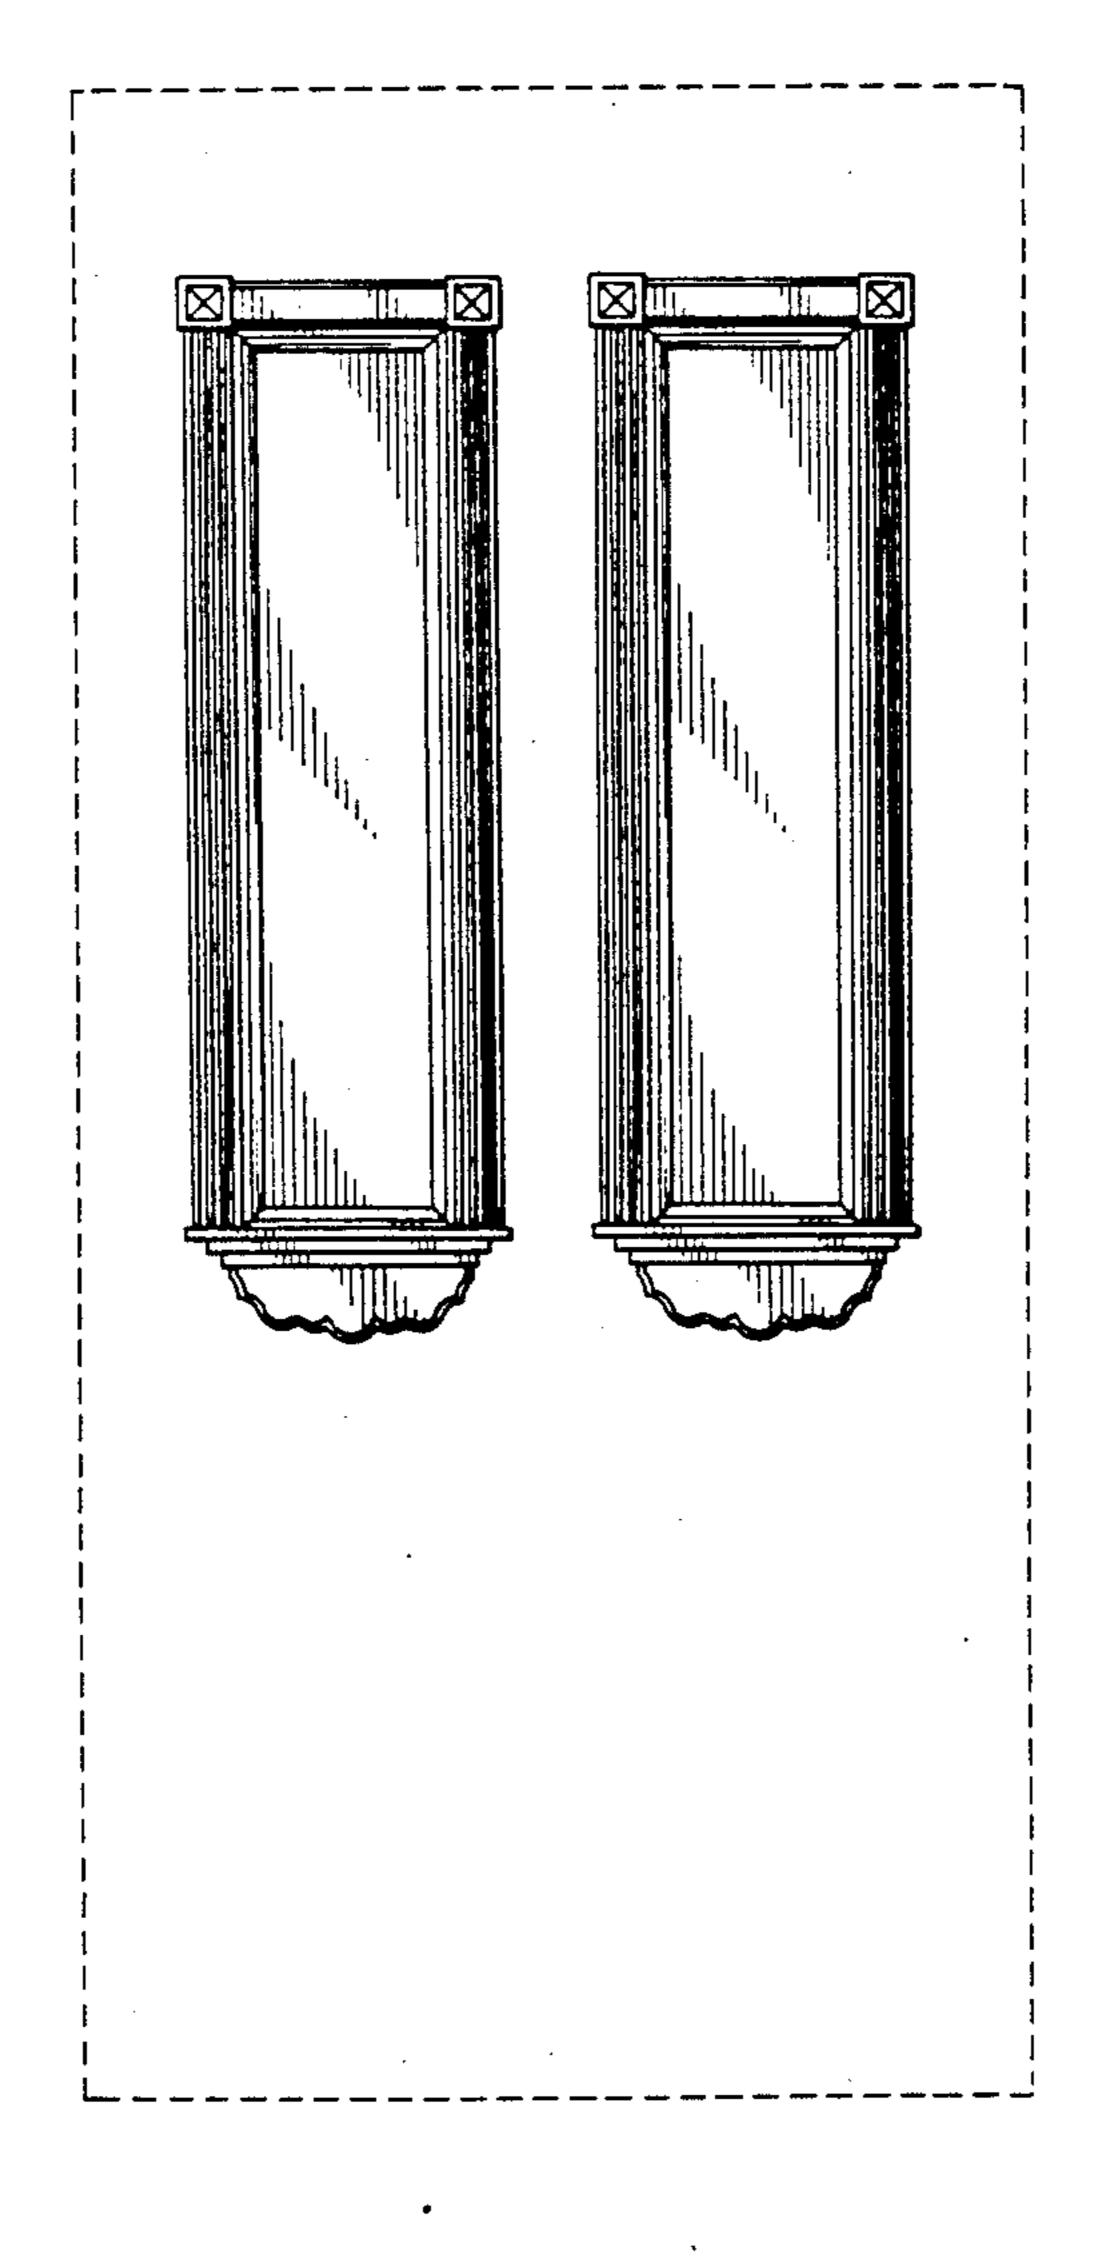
is a front elevational view of a door panel showing a third embodiment of my new design, the rear elevational view being identical to the front;
